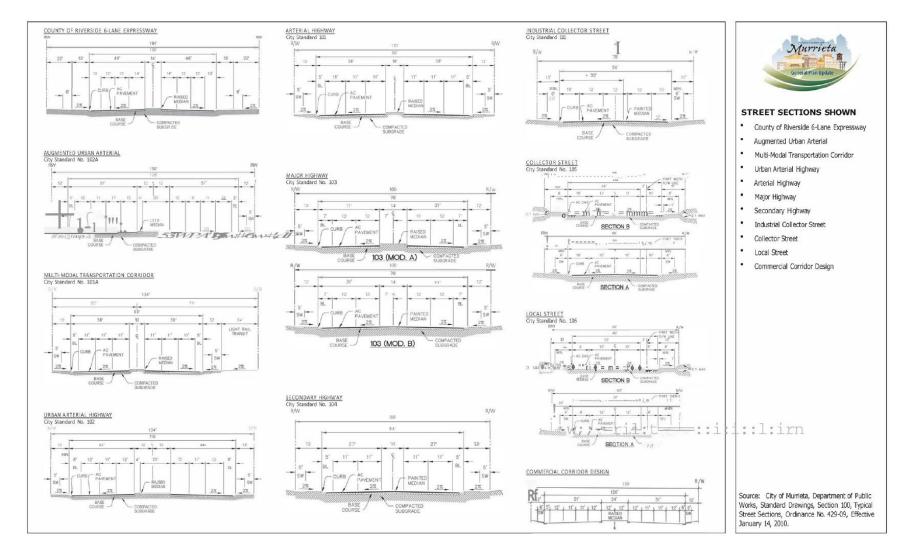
CITY OF MURRIETA ROADWAY CROSS-SECTIONS
